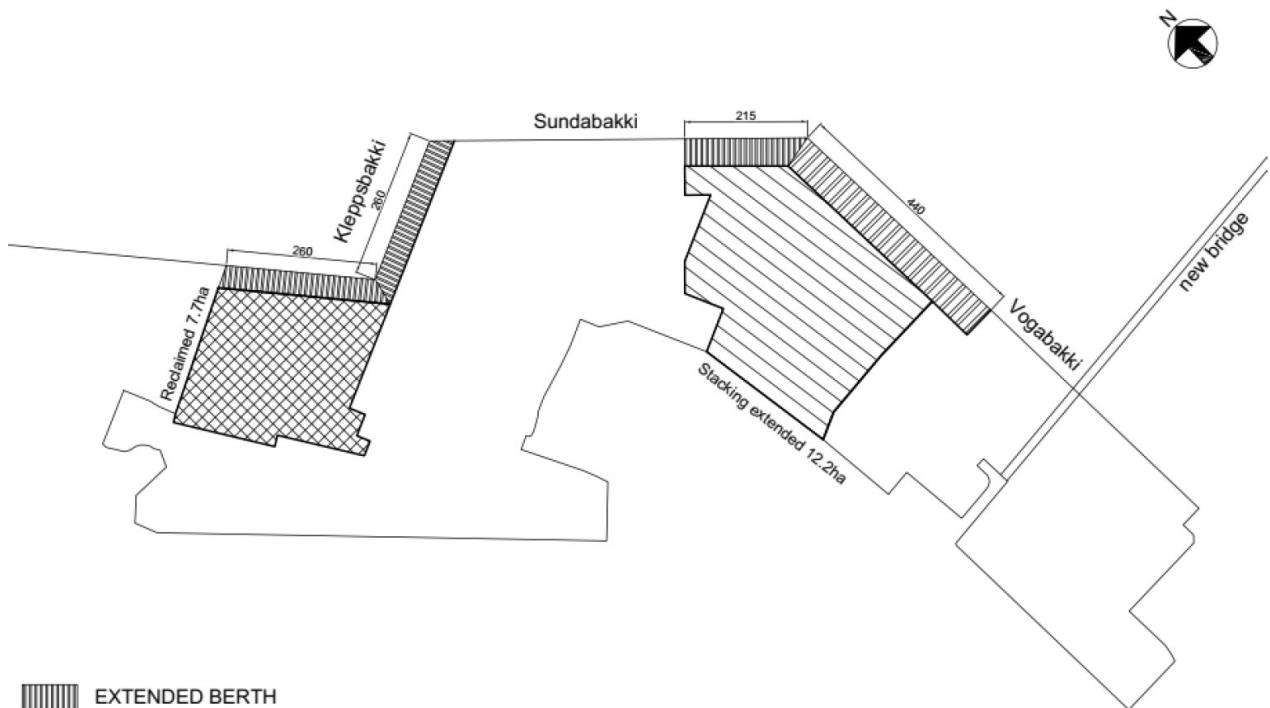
Alternative 0, Faxaport plan (source: Drewry report p.51)
